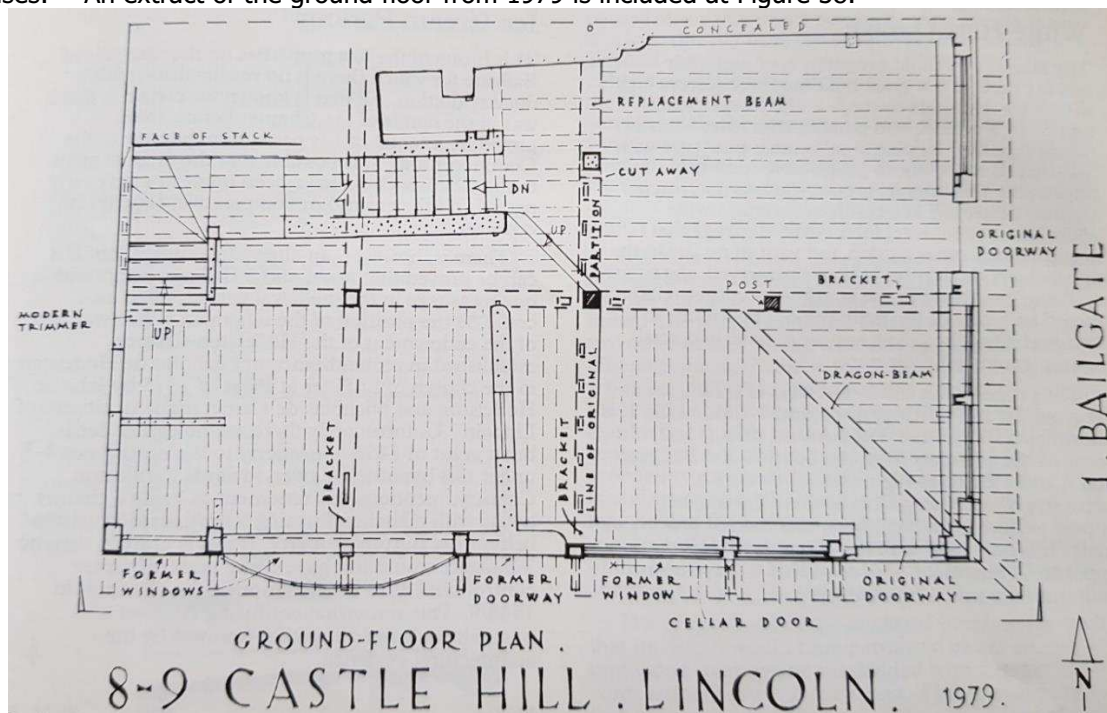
Ground floor plan surveyed in 1979.⁸¹
